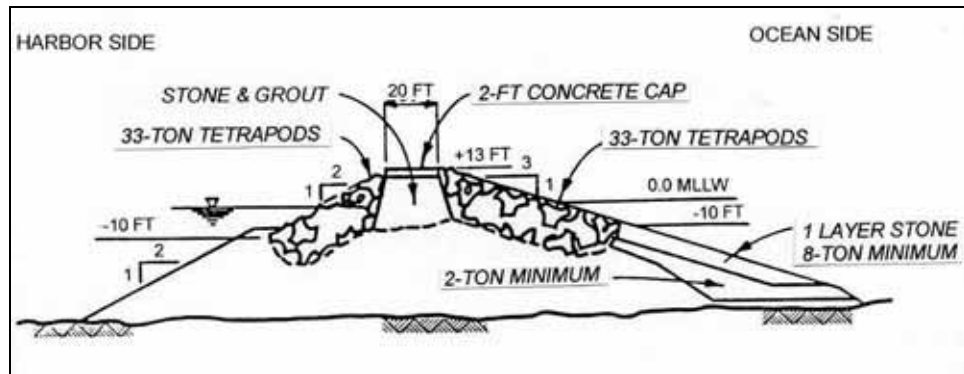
Typical cross-section for 1956 Kahului breakwater repairs.
